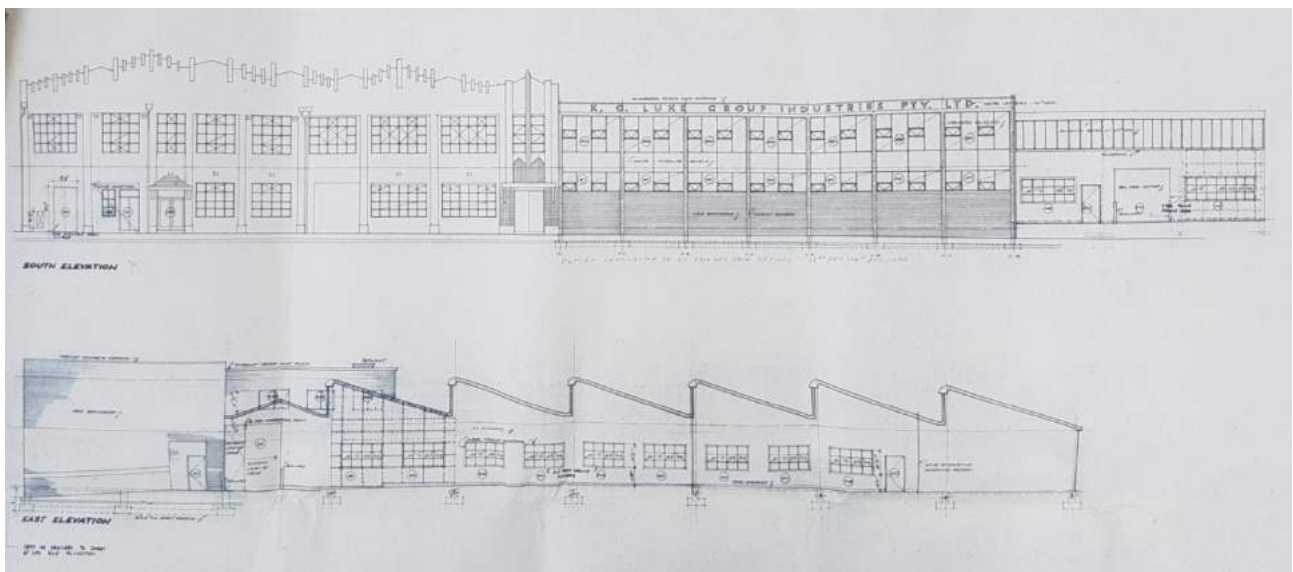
1965 drawings – the south and east elevations showing the two-storey 1937 Art Deco facade and the proposed section to the east (right) (PROV, 12 March 1965).
